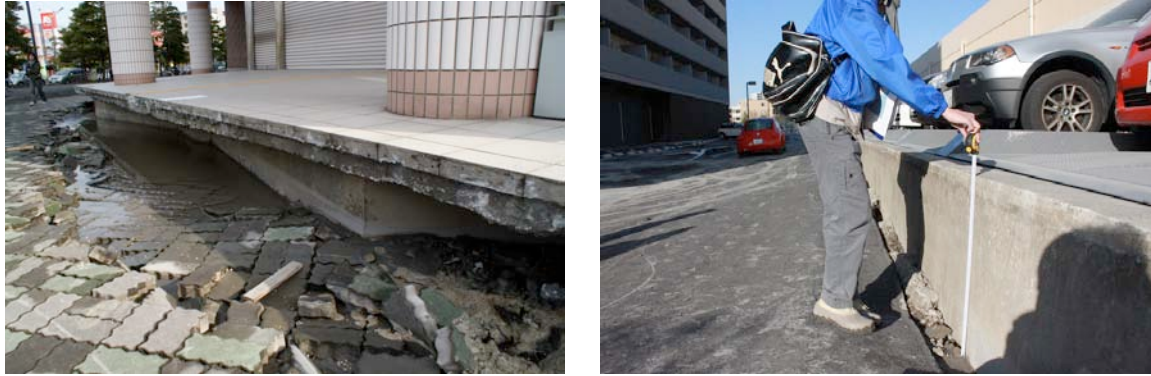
(a) Pile-supported buildings suffering large ground settlement (left) and (b) uplifted underground parking garage (right) (Tokimatsu et al., 2011)
